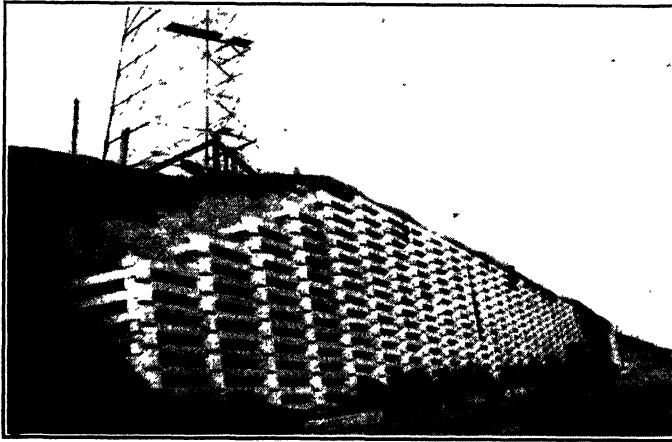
Face of reinforced-concrete crib retaining wall. (Photo by Tschebotarioff, Ref. 375, 1939.)
